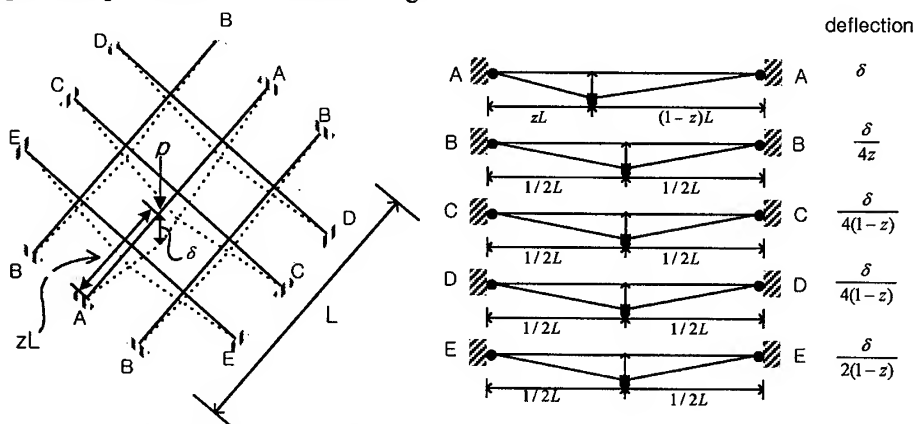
Plastic Collapse Modes of 3x3 Grillage under off-center Load
